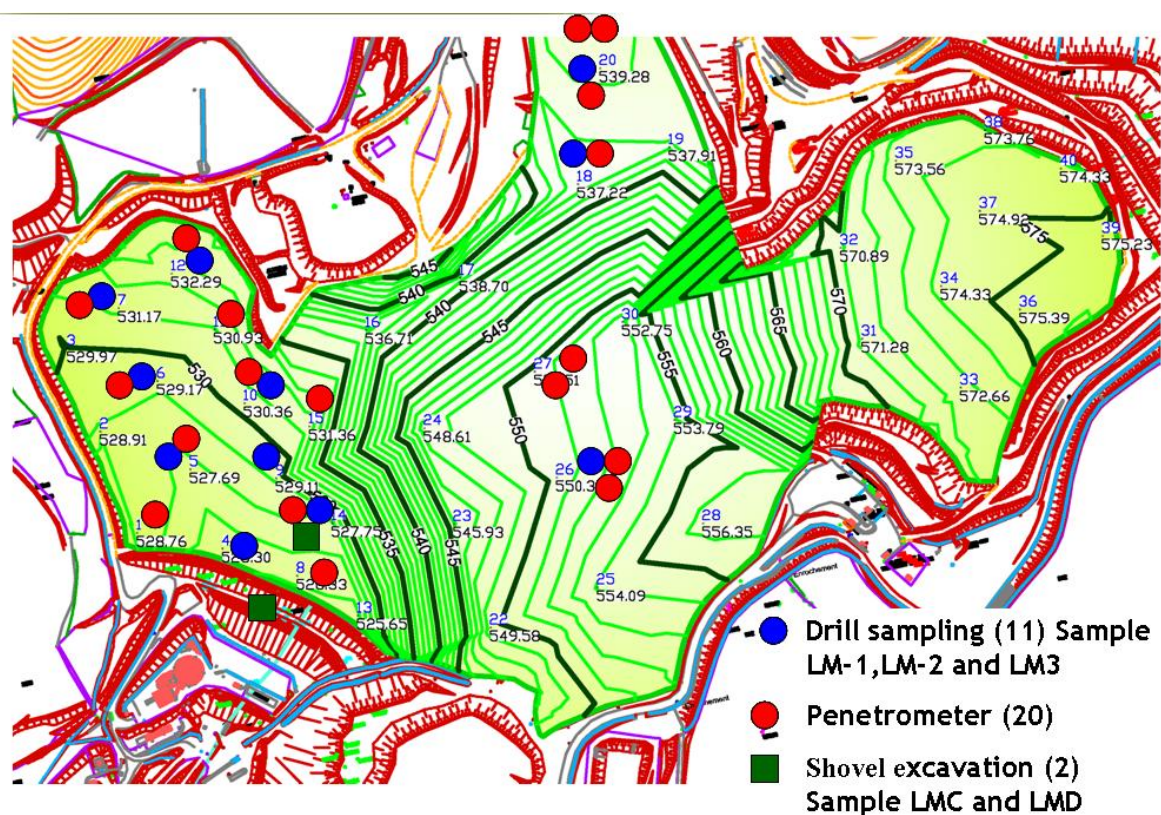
Landfill site ‘LM’ with sample retrieval details.
